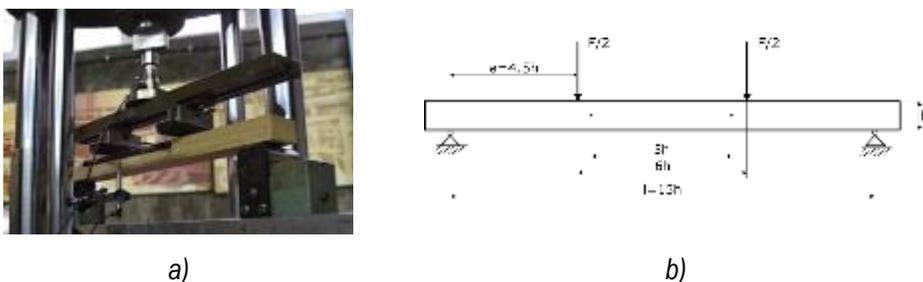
Four-point bending test: a) set-up of joint specimen in testing machine, b) diagram of loading
